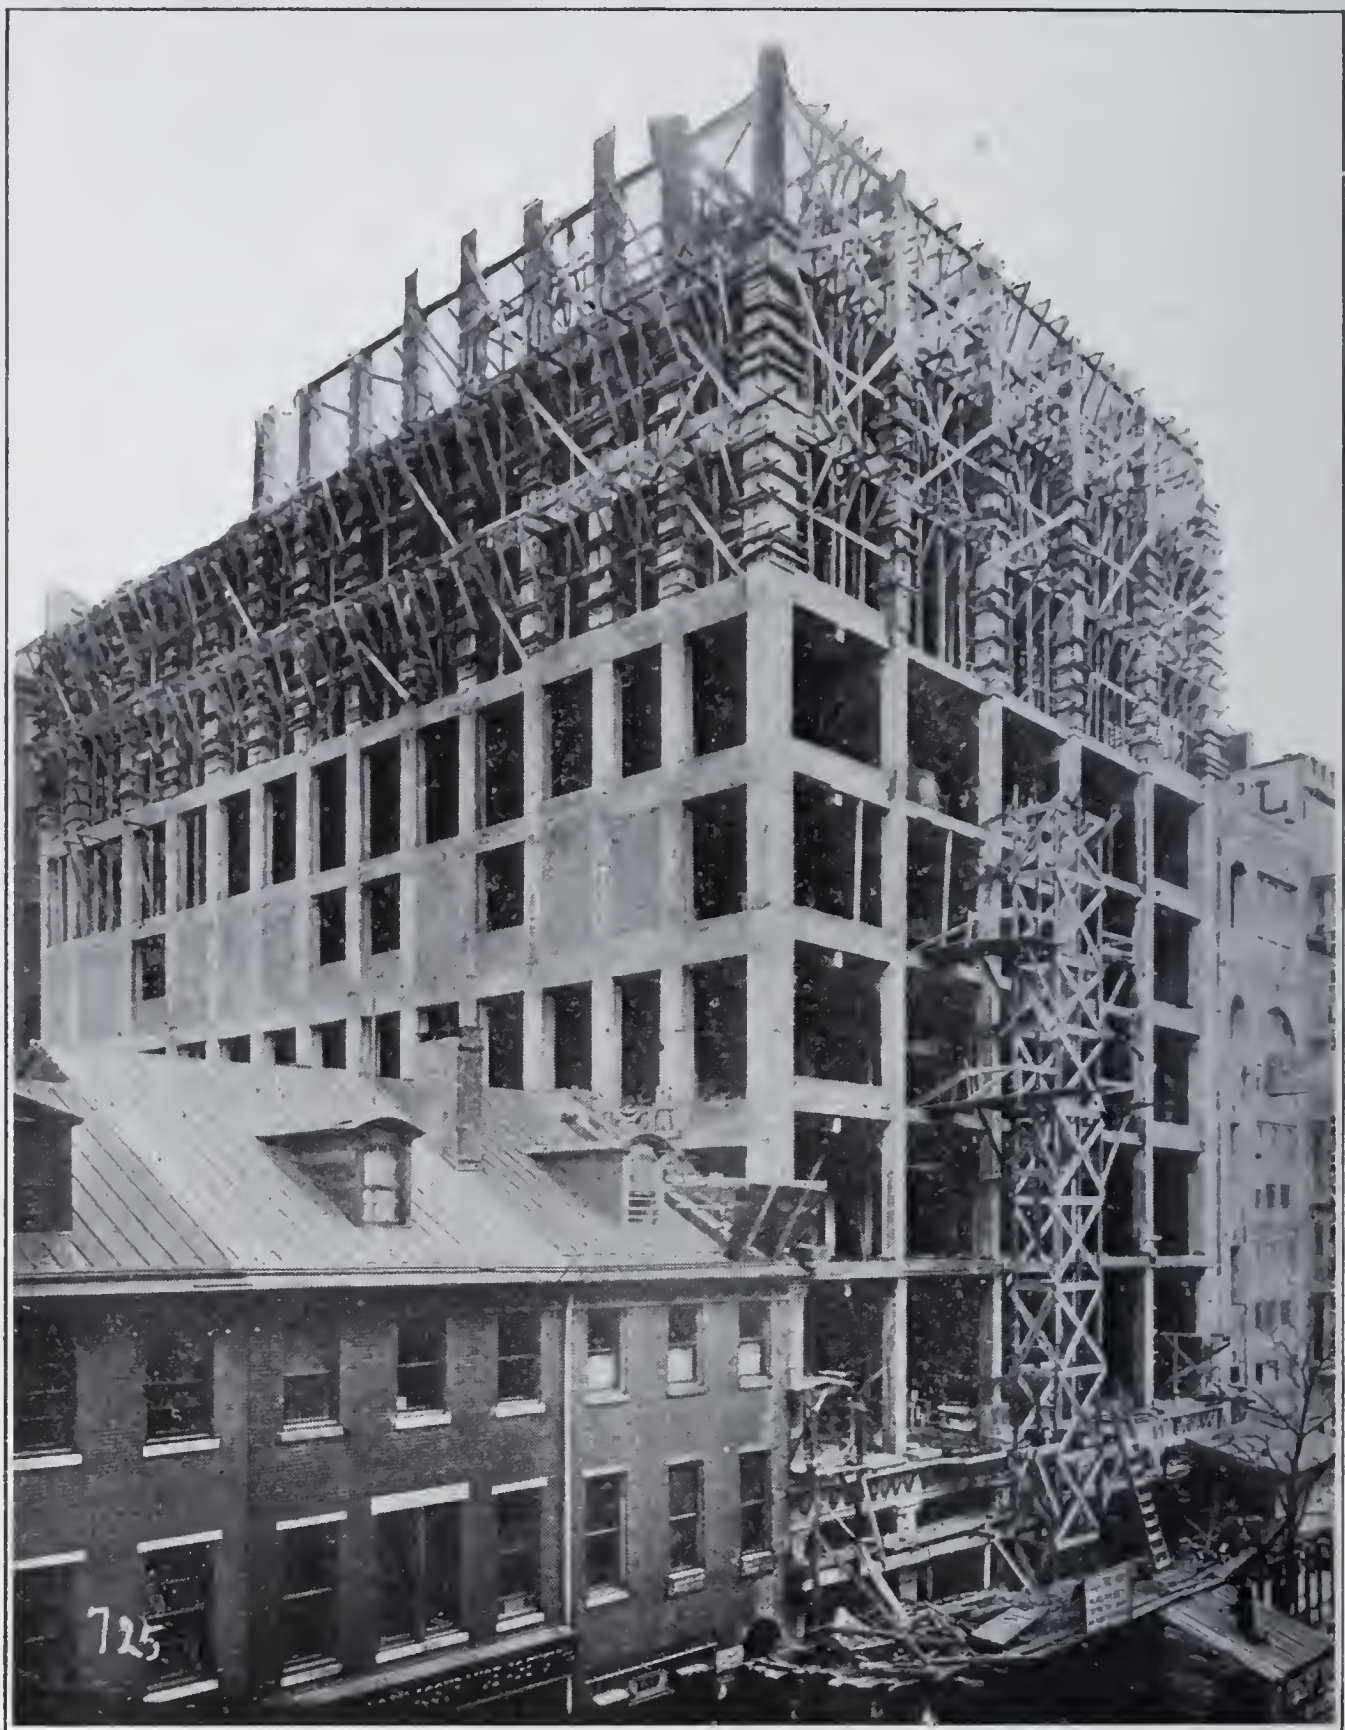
REINFORCED CONCRETE SKELETON CONSTRUCTION, BOYERTOWN BUILDING.
